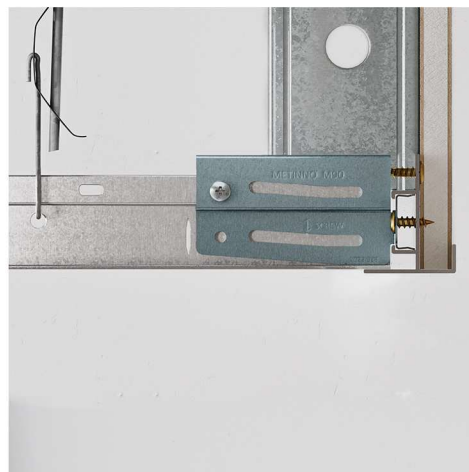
Floating Ceiling-Wall Connection with M90 Clip
